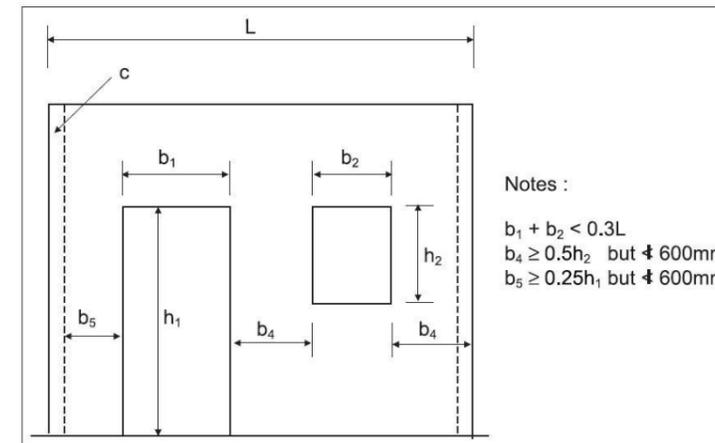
Recommended openings in bearing walls in rubble masonry
